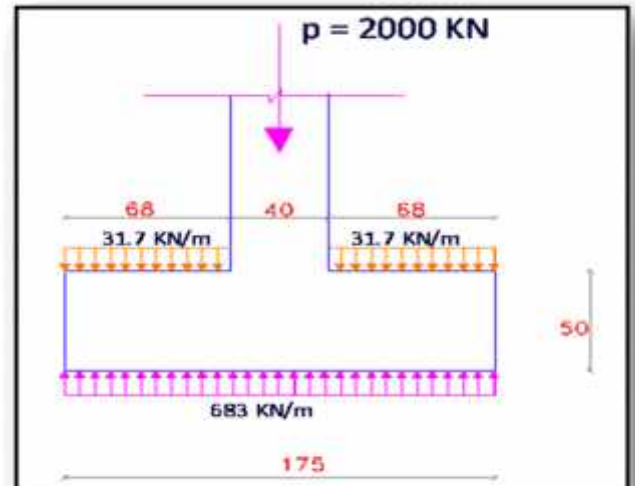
Structural system of Isolating Footing (Section A-A)
